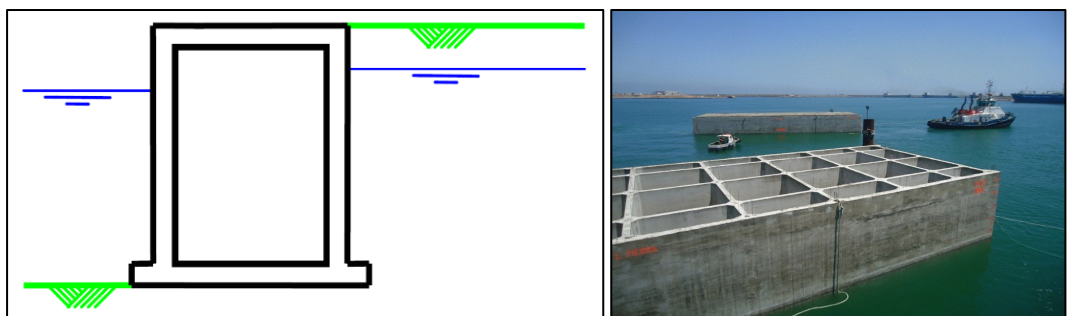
Example of Caisson wall (Meijer, E) (Cyes)
